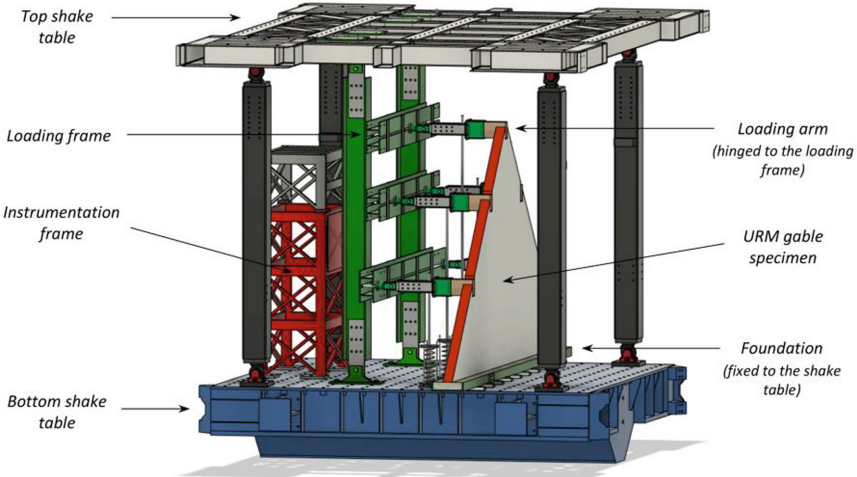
Three-dimensional view of the shake-table testing setup of the 9D LAB.
